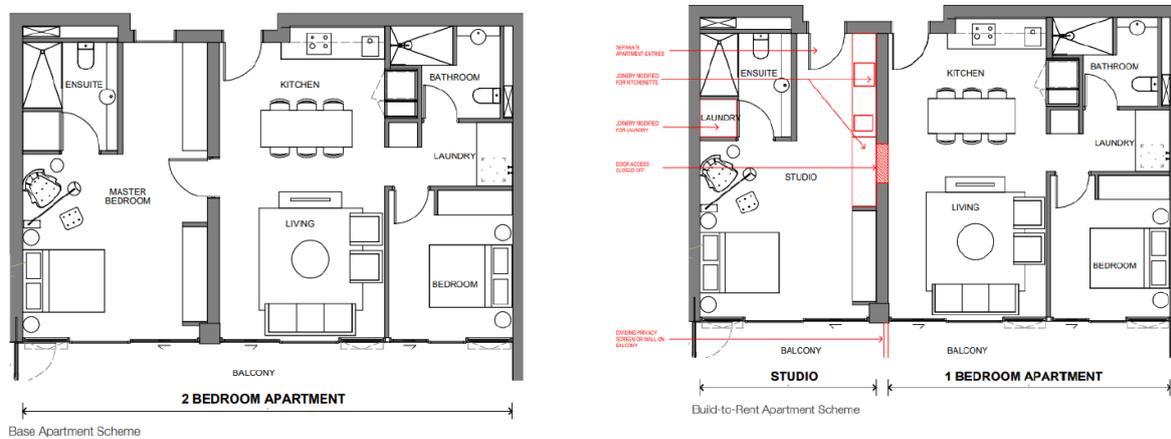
Proposed convertible apartment scheme. Typical 2-bedroom apartment (left) and converted 1-bedroom and studio apartments (right).
